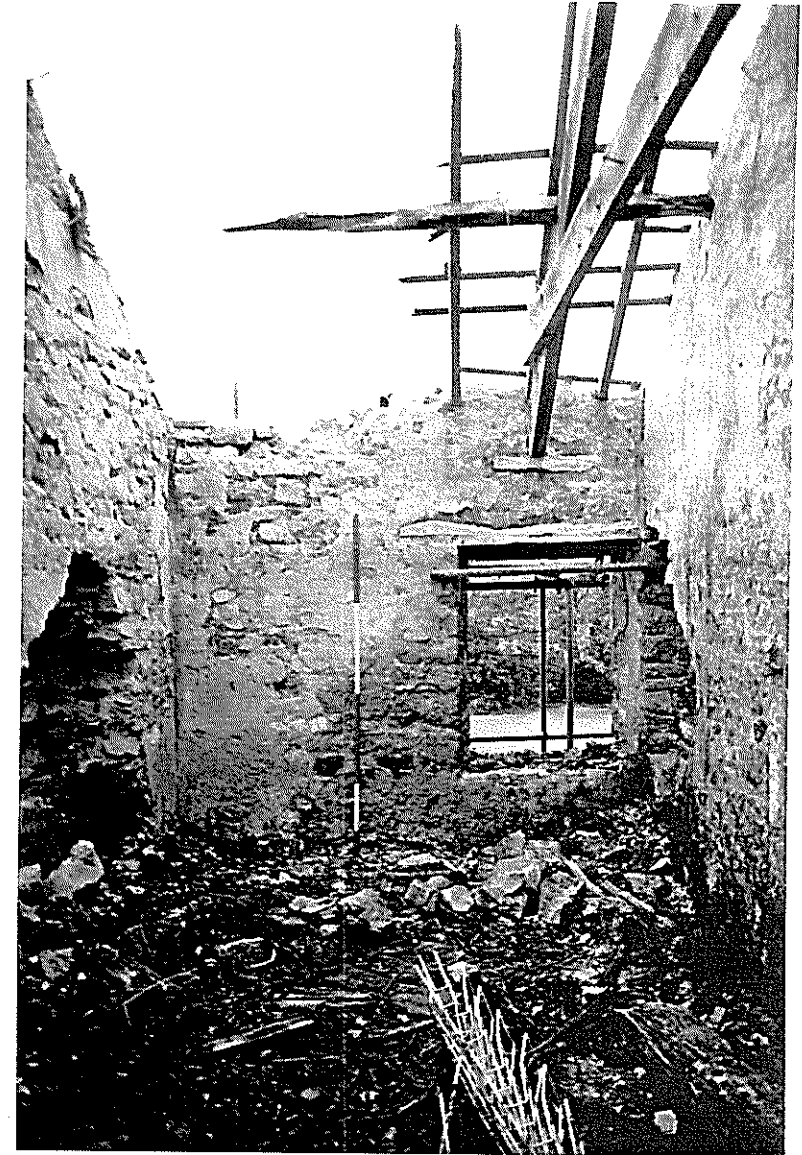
Lydstep Palace, Room 5 interior: South wall
